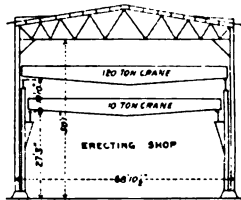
CROSS SECTION OF CROSS ERECTING SHOP, BROOKS
